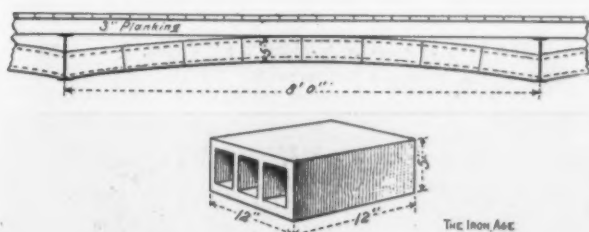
Type of arch and hollow tile used in the flooring of the Equitable Building. It is reported that the haunches were left hollow and not filled in with concrete. The heavy wooden flooring was completely consumed.
